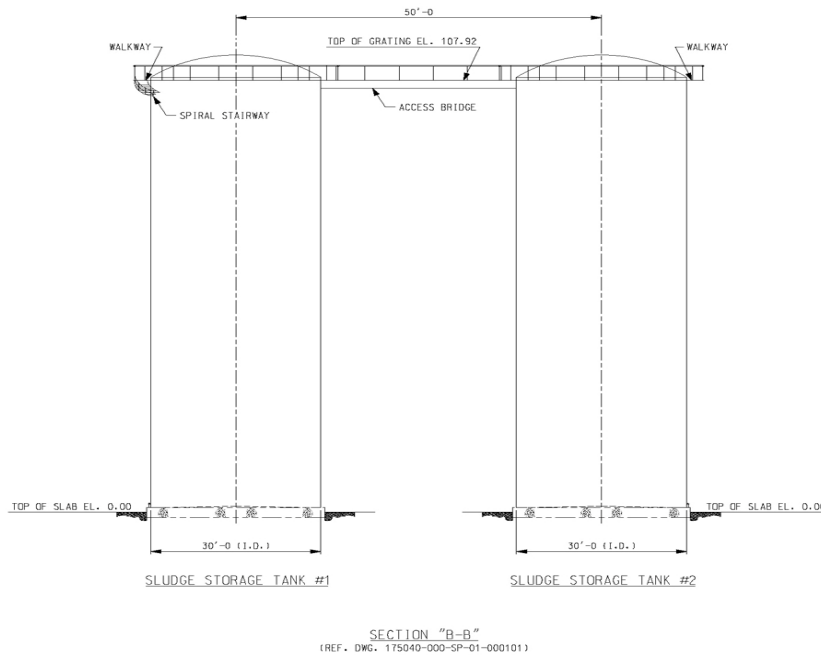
, Section B-B, View of Existing and Proposed Sludge Storage Tanks.
